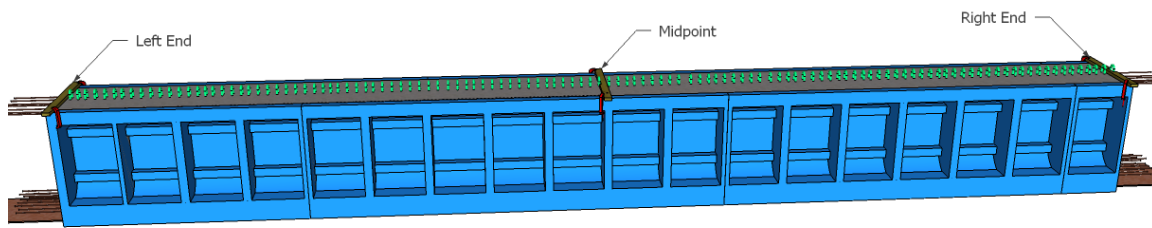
Casting of PPCB with 2x4s to establish flat surfaces
